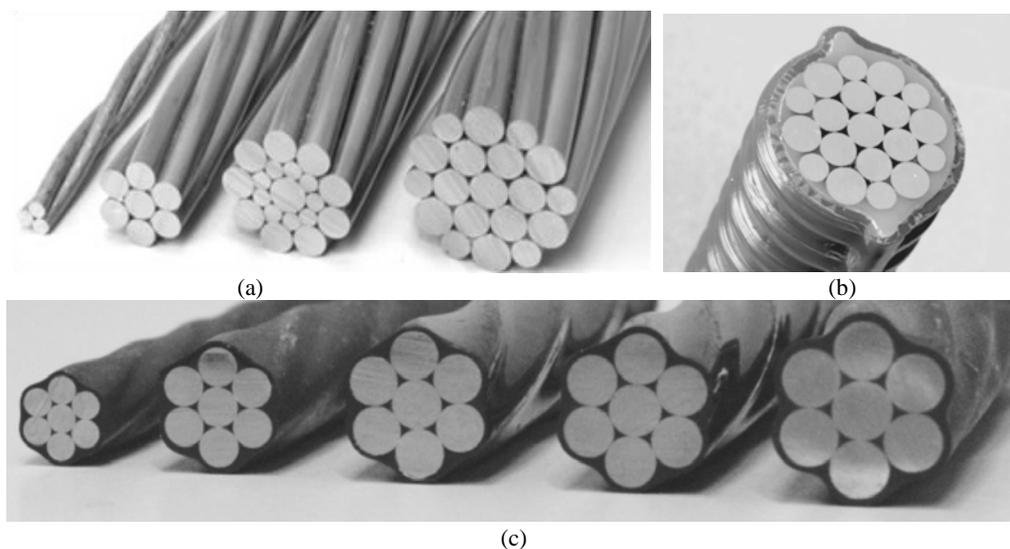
Examples of strands used in prestressed concrete : (a) Bare 3-, 7-, and 19-wire strands, (b) 19-wire grouted strand, and (c) different sizes of coated strands. (Oshima et al., 2016)
